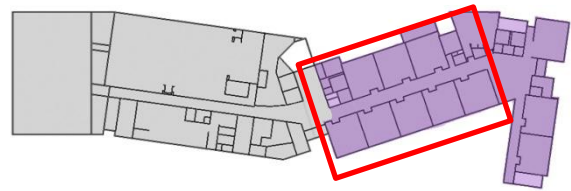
Education Wing Highlighted on Building Floor Plan with Structural Bay Redesign Called out in Red
